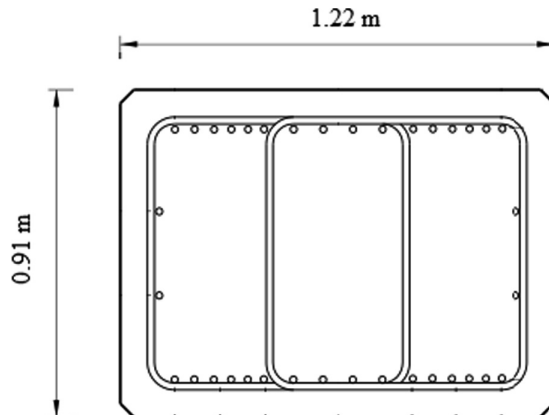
Transversal section of the pile cap of the Halls River Bridge.
